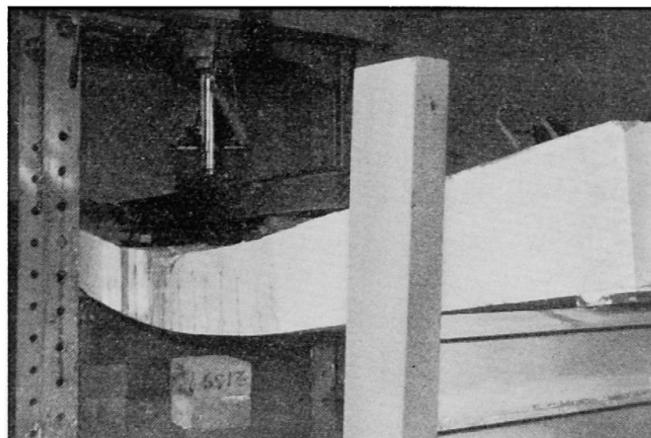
A beam with a bent plate joint and failure due to crushing of the concrete.
